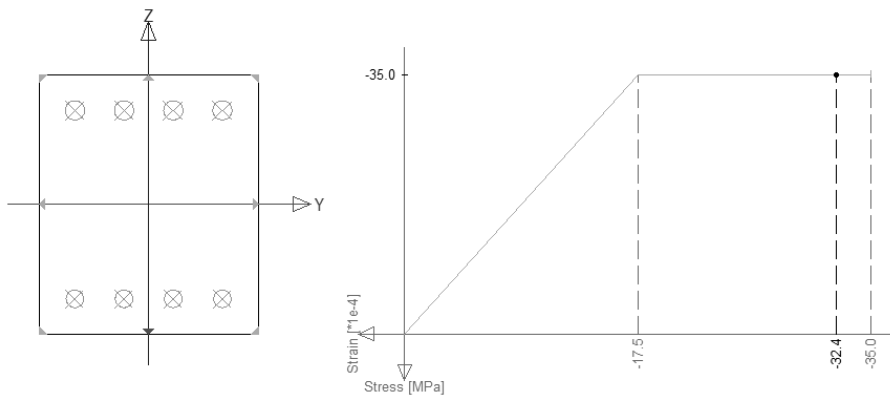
Concrete Stress - strain relation within concrete compressive zone of the cross-section at the support
